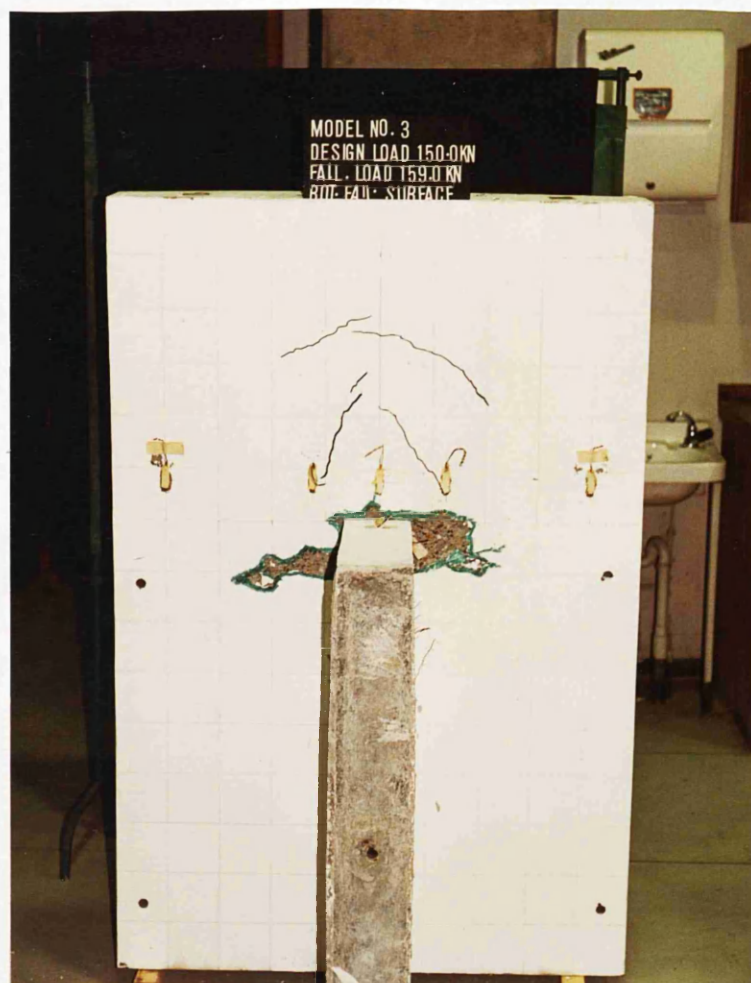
Photograph showing the bottom failure surface of model PS3
